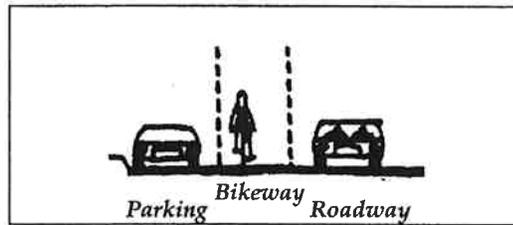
shows Class I, II, and III bikeways, as defined and illustrated below, and Table 2-3 lists the bikeways falling within each class.
